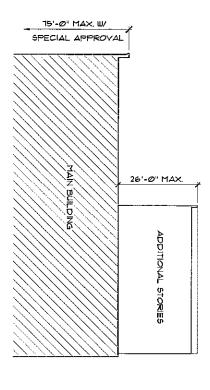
Additional Stories height is measured from the top of the adjacent building roof to the top of the highest additional stories parapet.
